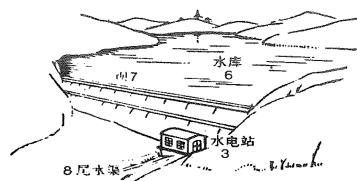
A plant using a dam to form a head drop (station house at the bottom of the dam).
